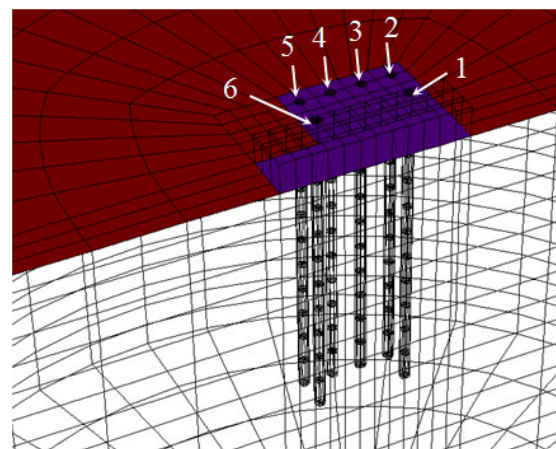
FEM-model with numeration of piles for the final design of the foundation extension with 2 x 6 concrete piles.
